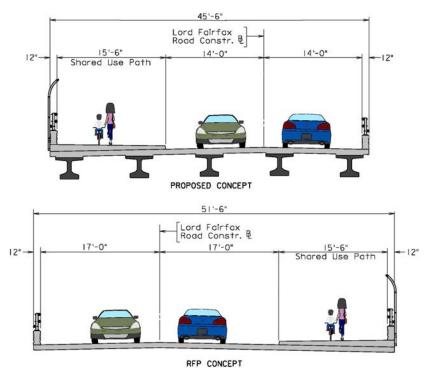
Typical Transverse Section (Looking West)
